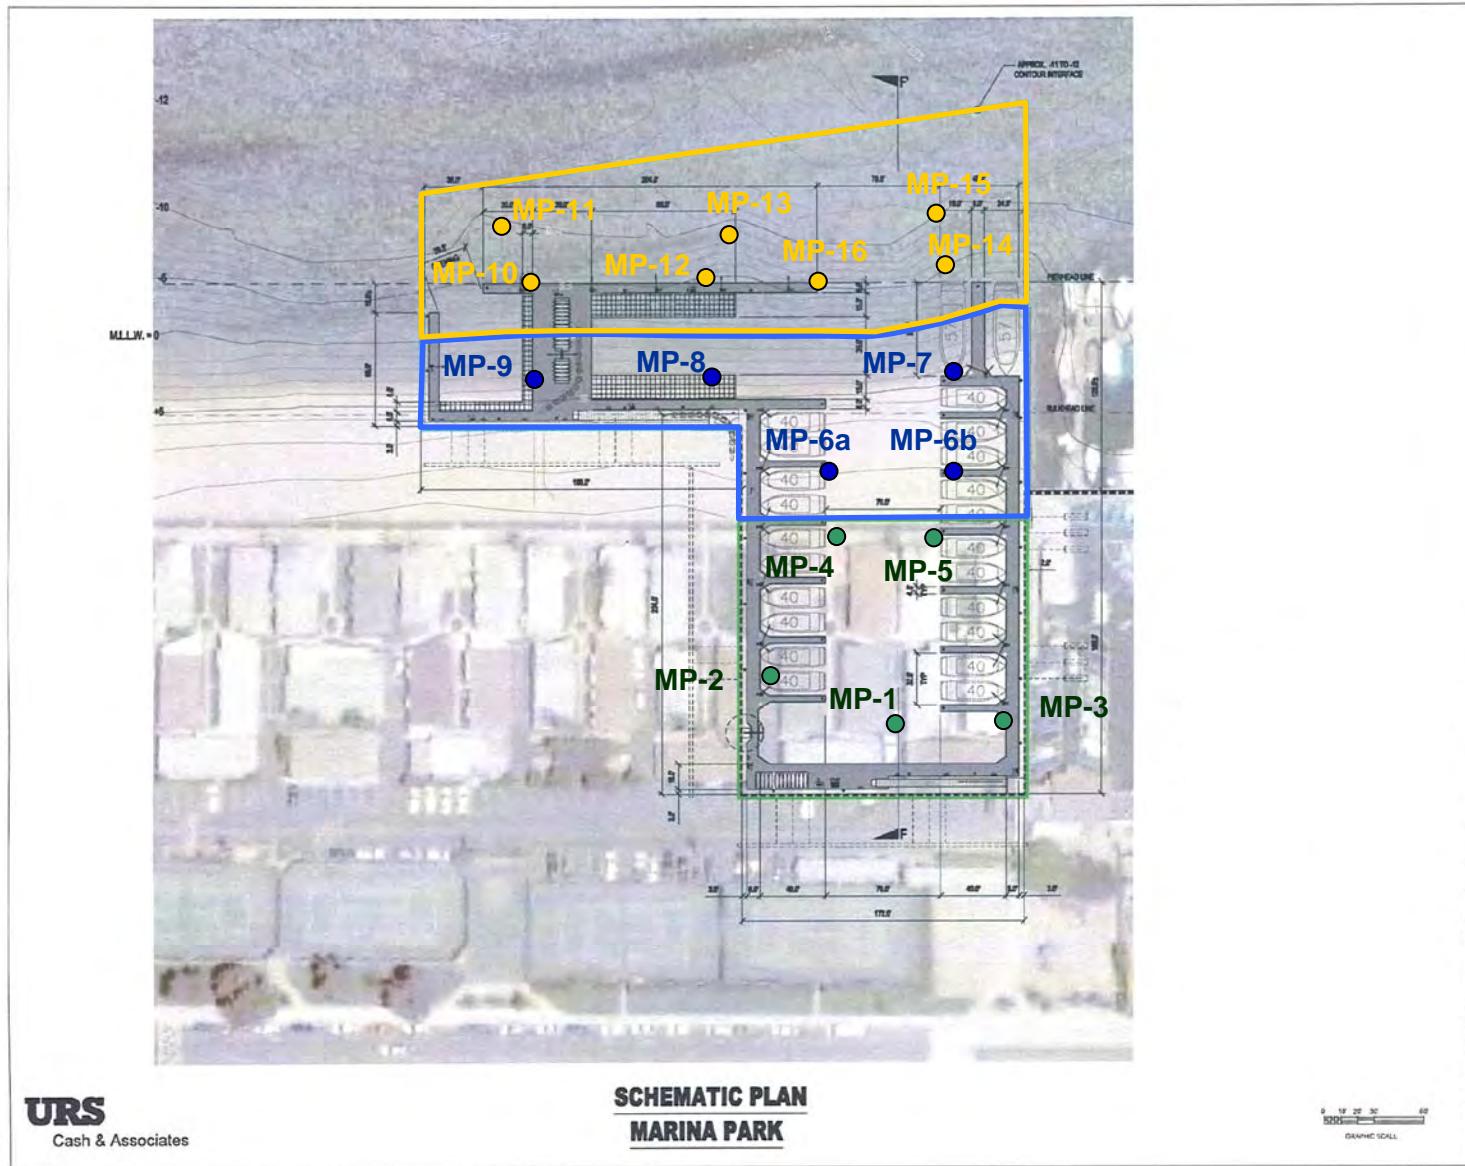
Project Areas and Station Locations with Proposed Project Plan and Current Bathymetry
